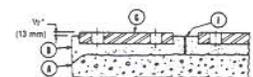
TYPICAL RAIL WITH EXPANSION JOINT SECTION
